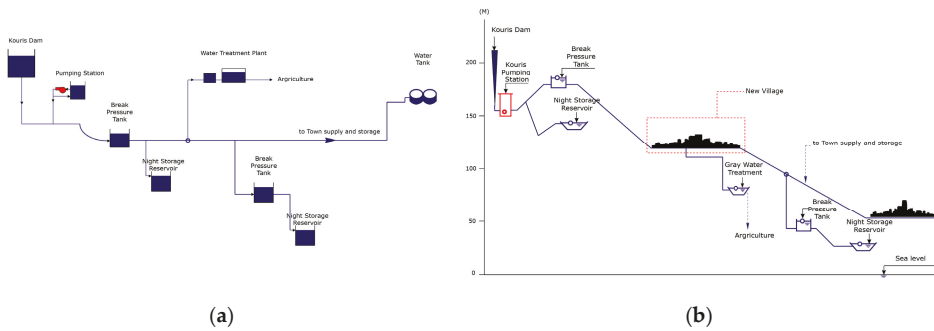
Water distribution schematic diagram: (a) Plan; (b) Section. Source: author’s drawing.
